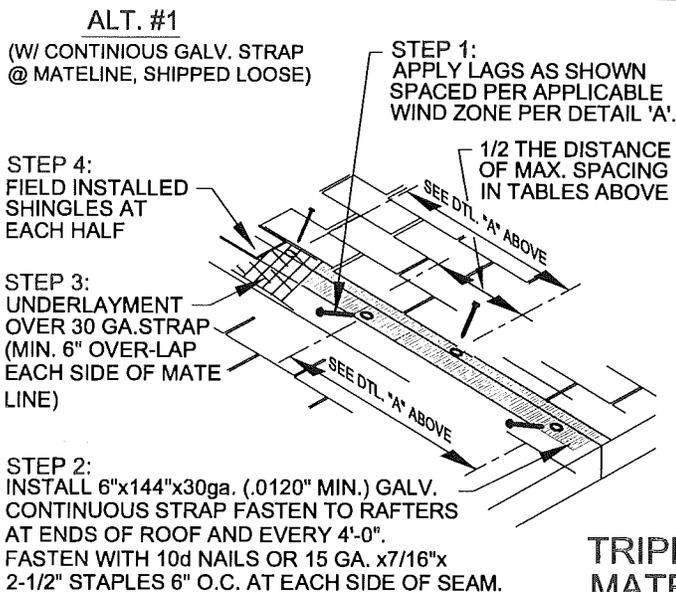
SHINGLE ROOF CLOSE-UP
